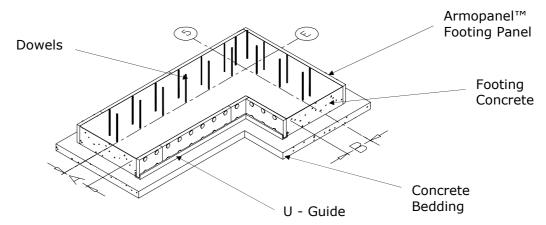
Detail Footings are made from ArmopaneI™ Foundation panels
